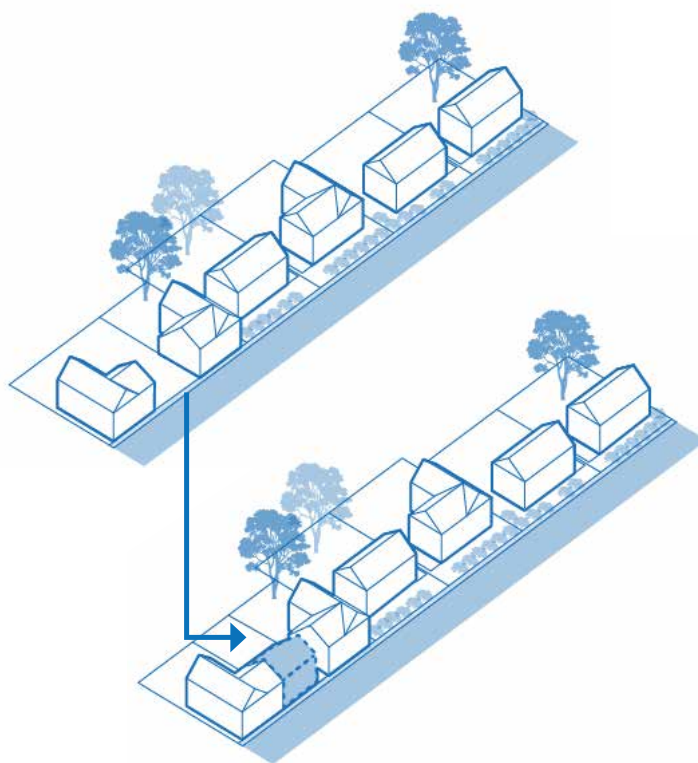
Diagram demonstrating infill development along the building line that complements the street with consideration for the established building line, building mass, dwelling type and orientation.
